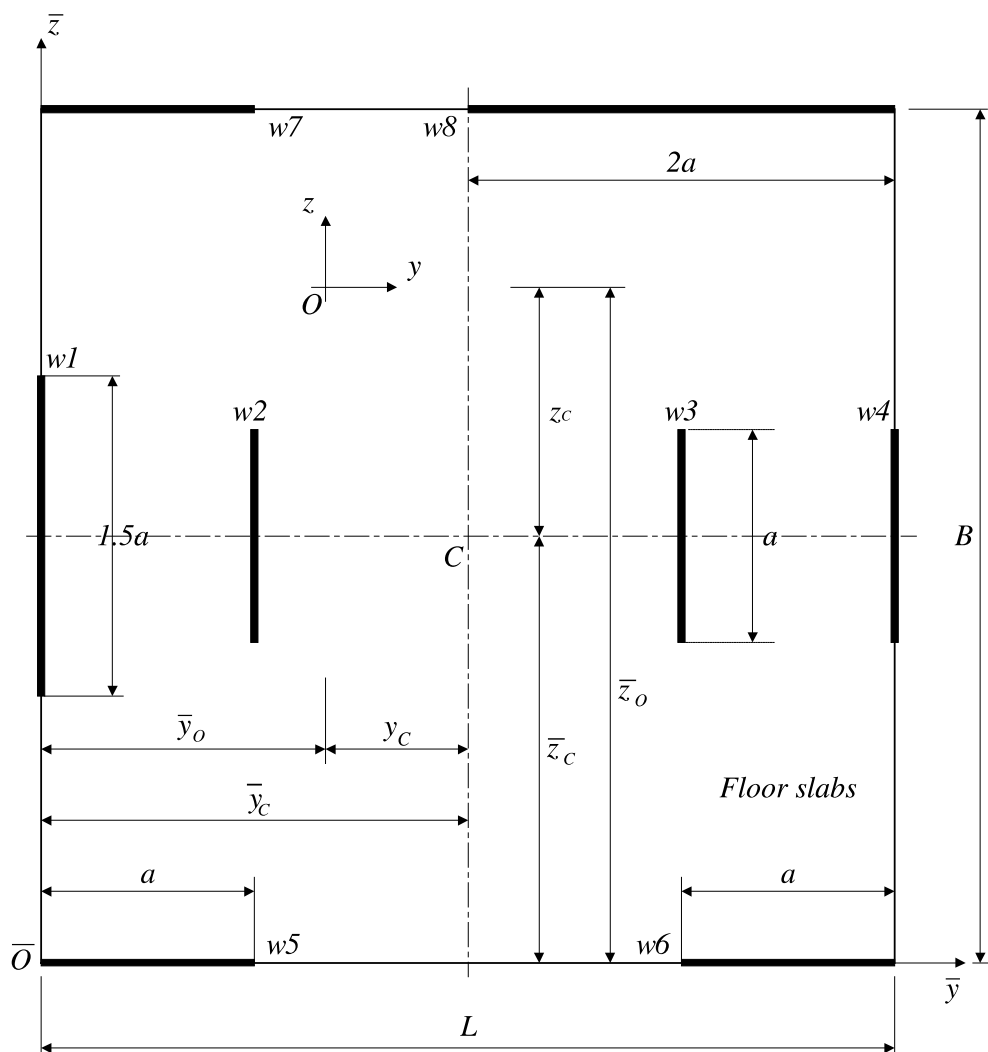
Floor plan of a general asymmetric shear wall structure.
